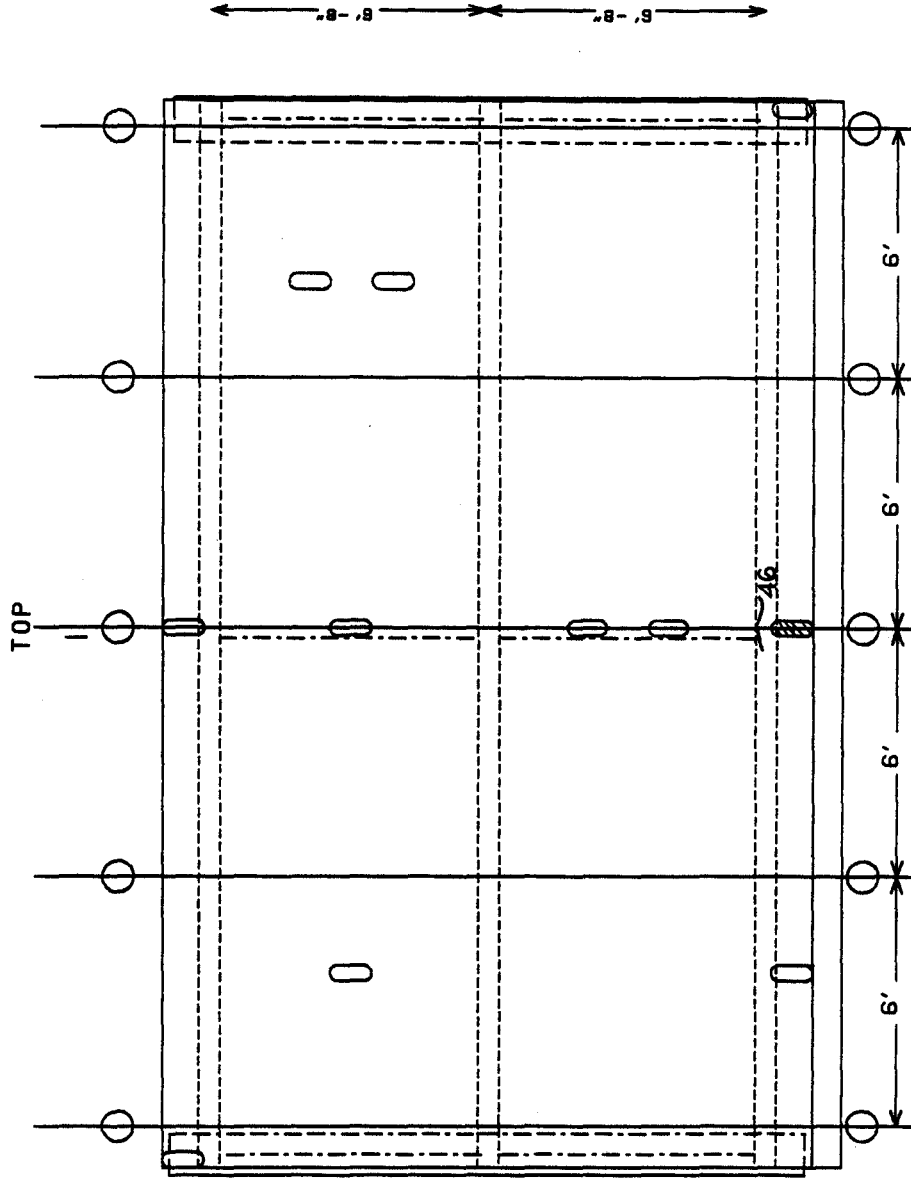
Top Cracking Pattern (First Bridge - Test No. 3)
